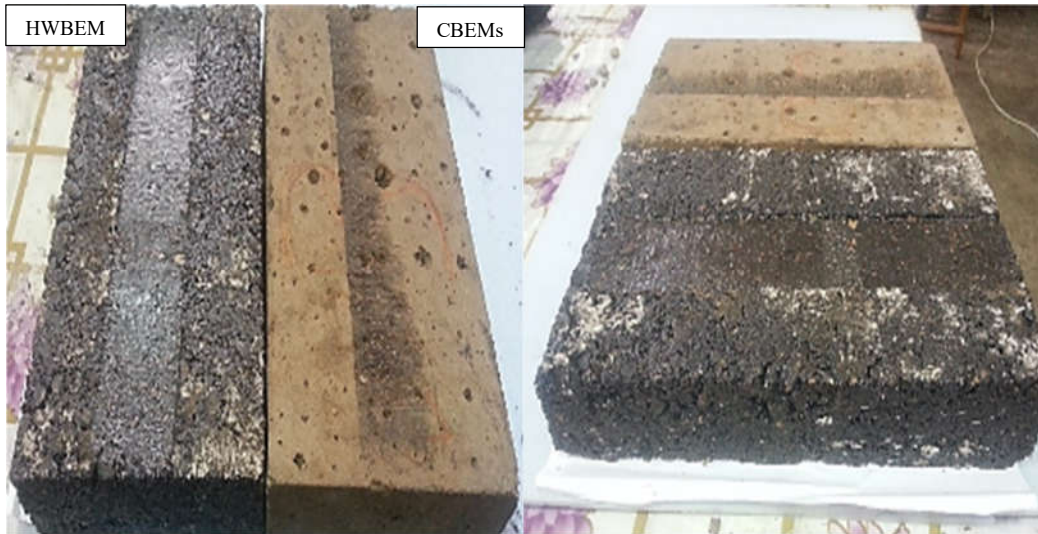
Depth the Rutting in Specimens the Wheel Track after the Test
